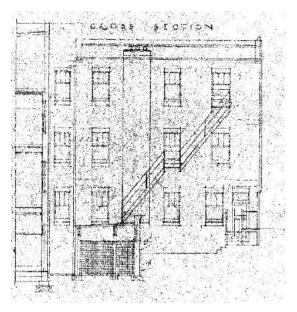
Fortune of War Hotel, 137 George Street, rear elevation with an external steel fire stair (now removed) that was 2'6" wide and serviced the first and second floors. Access to the stairs was via the box frame windows. Source: City of Sydney Archives BA BA86/1920.
